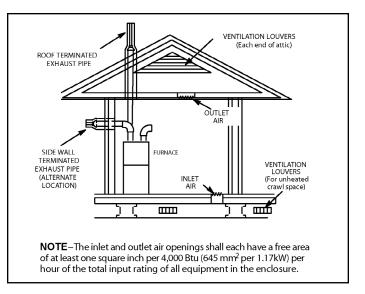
Equipment in Confined Space - All Air from Outside (Inlet Air from Crawl Space and Outlet Air to Ventilated Attic)
